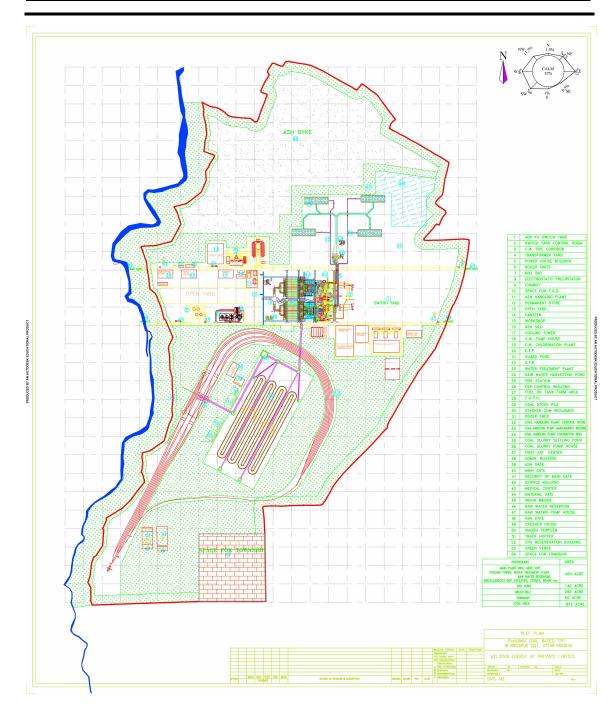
PROPOSED POWER PLANT LAYOUT
